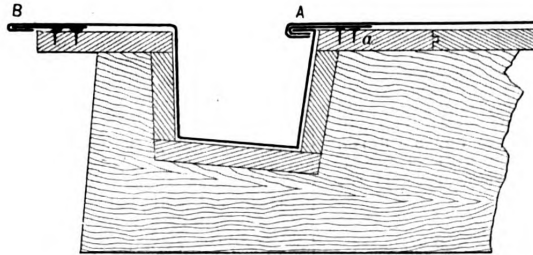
Method of Securing Roof at Gutter and at Eaves.
